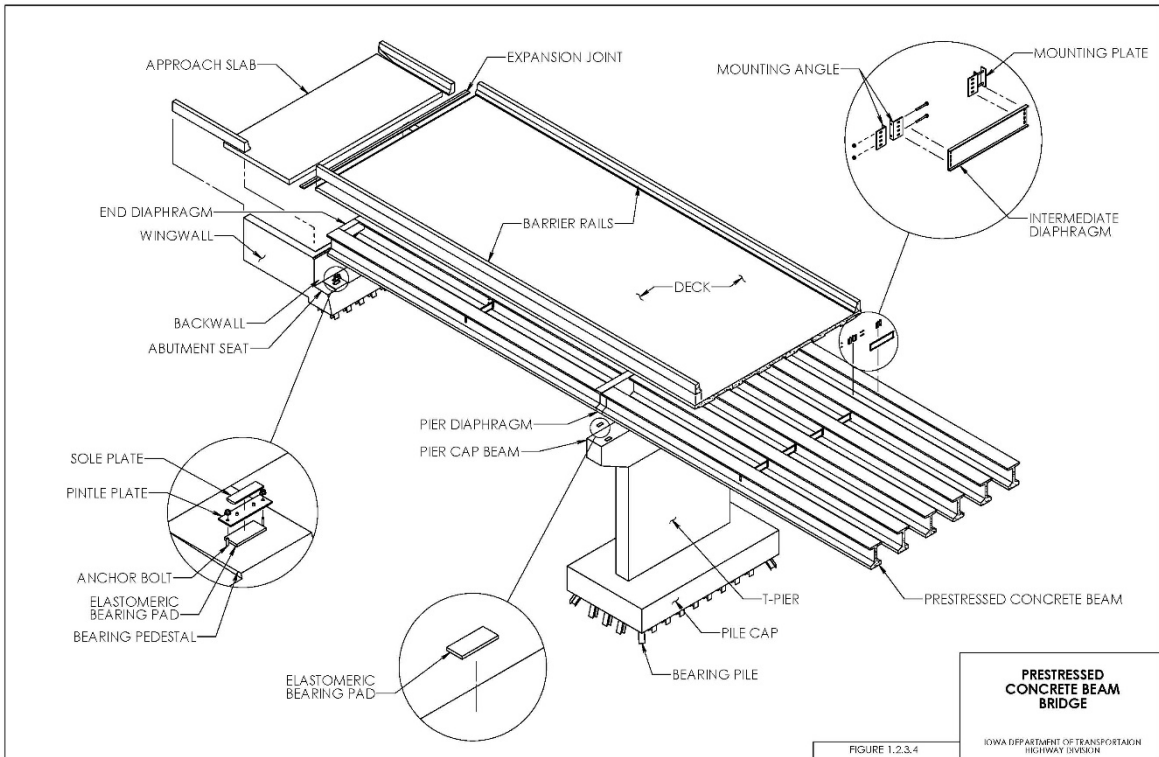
Prestressed Concrete Beam Bridge Components
